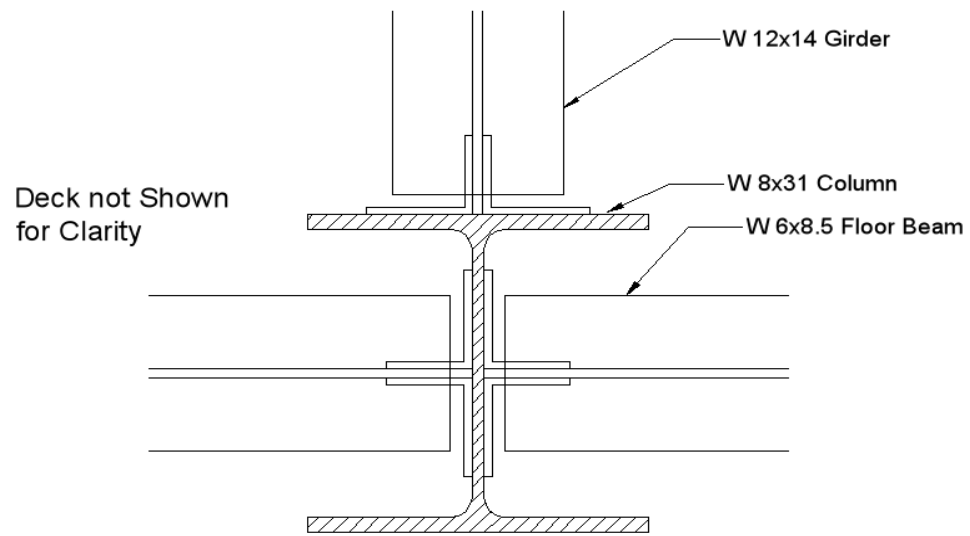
Girder and Floor Beam-to-Column Connection Detail (plan view)
